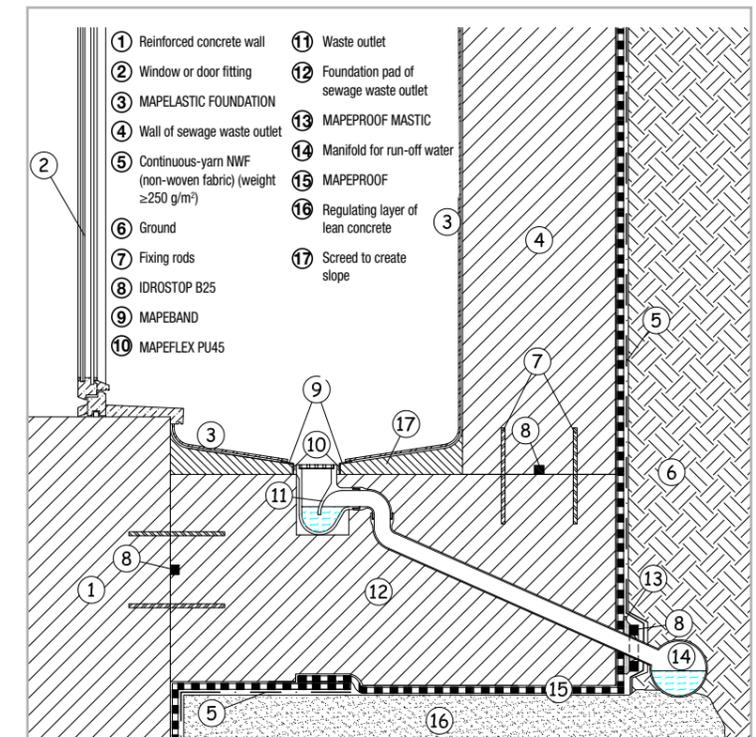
Detailed layout of waterproofing an aeration outlet cast in place
